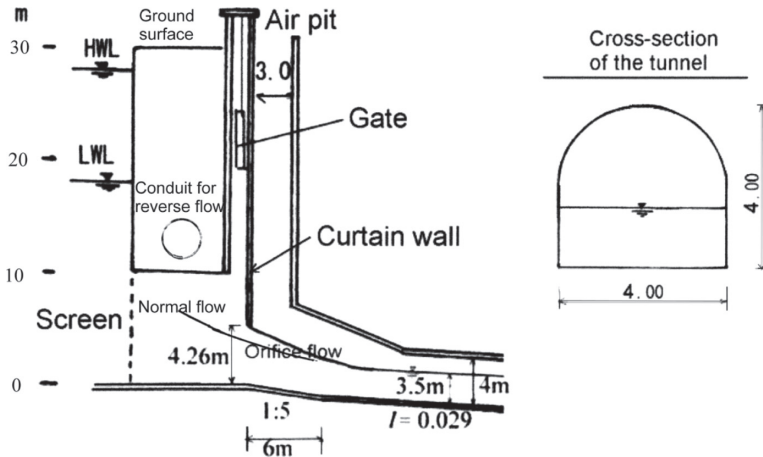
Longitudinal profile of the entrance of the by-pass tunnel and the standard cross-section of the tunnel.
